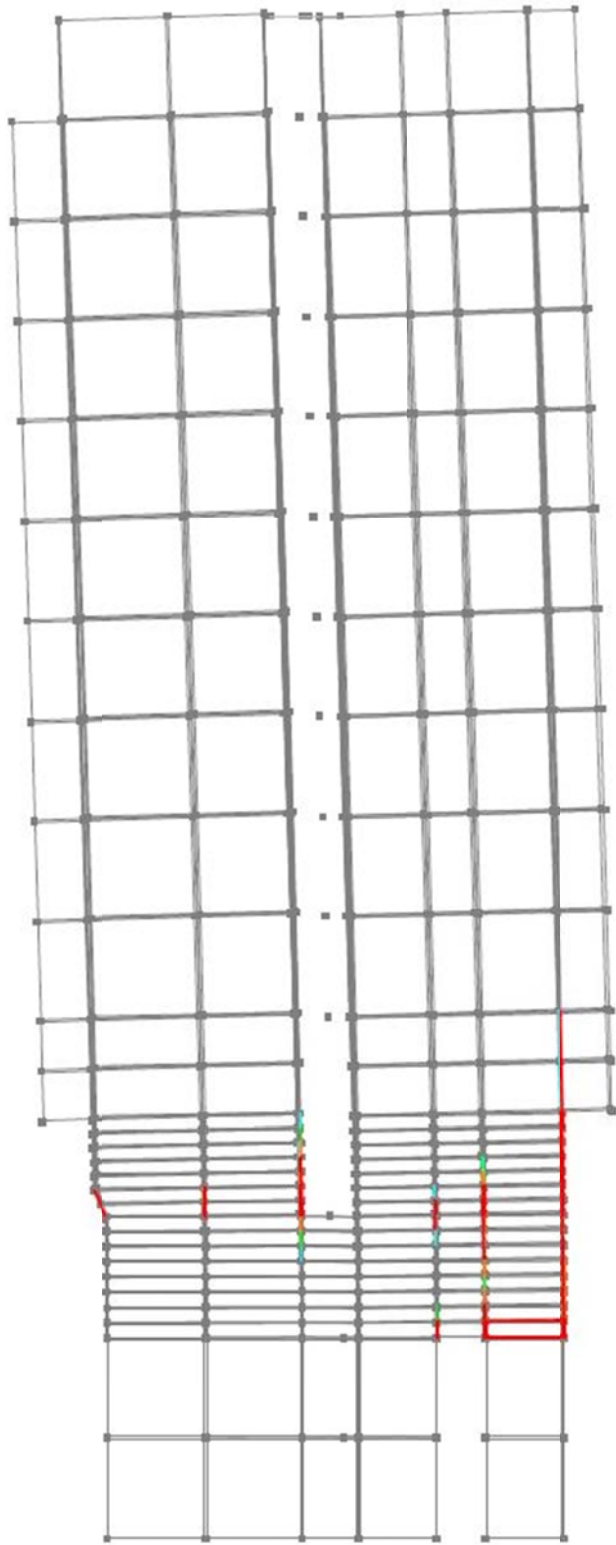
Deformation concentrations of the modified Perform 3D model under loading to the east at roof drift of 0.75% after “Concrete Crushing W13-E”
